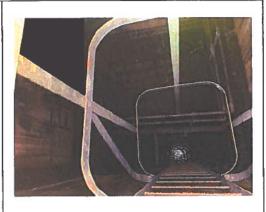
Crumbles Outfall – Inner chamber (Royal Parade) access arrangement.
